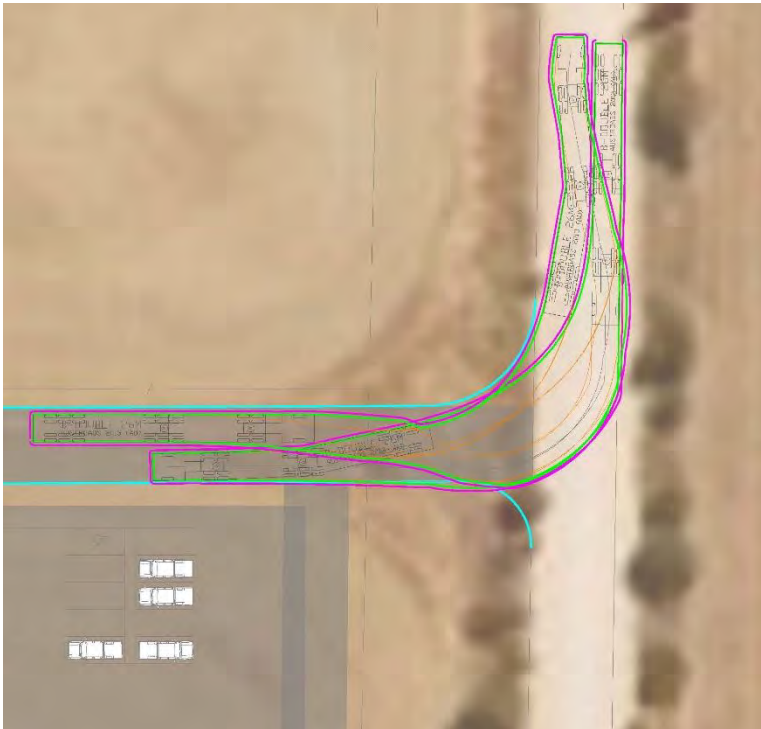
B-Double entry and exit via Pine Corner Road northern access
